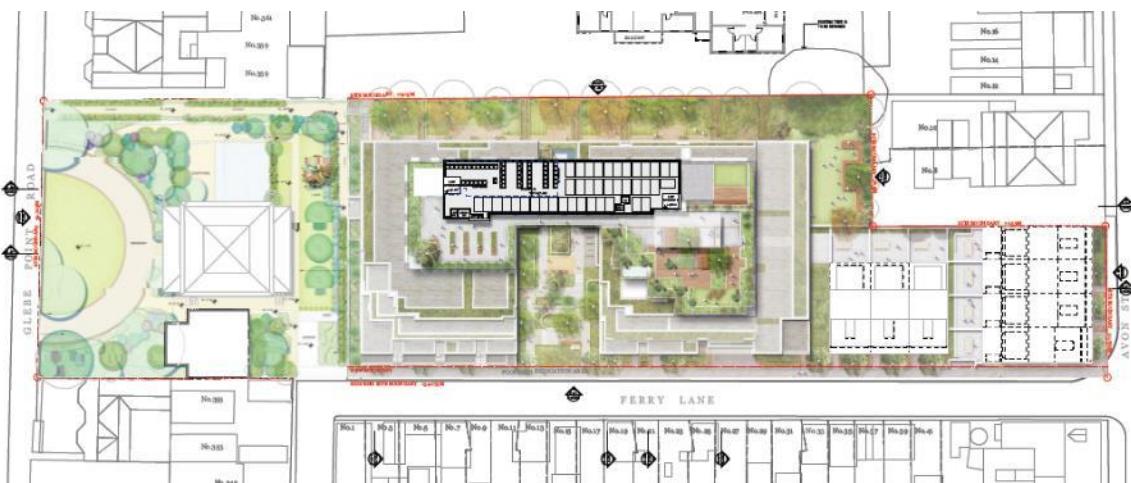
Proposed site plan depicting Bidura House to the left, the residential flat building (centre) and the Ferry Lane/Avon Street terraces to the right
